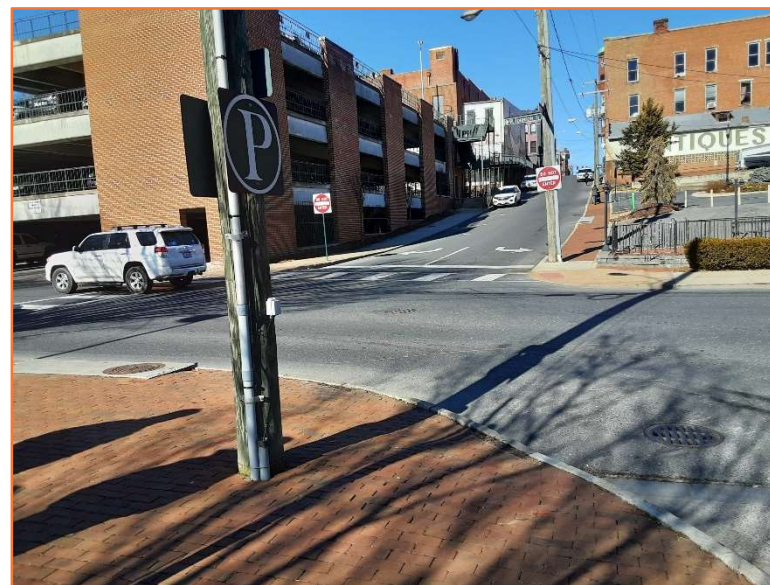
Site Visit Photo of W Johnson St at Central Ave
